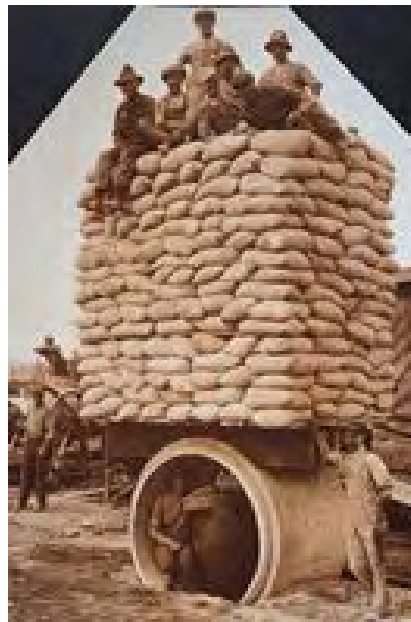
Early concrete pipe testing (Photo courtesy of Hardie Pipe, Inc.).
